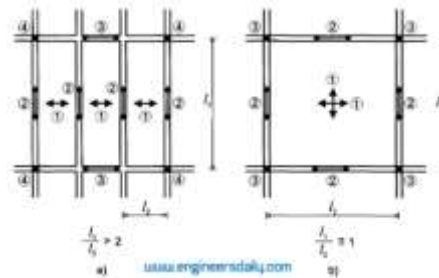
Gravity load path in a floor slab: a) one-way system; b) two-way system
